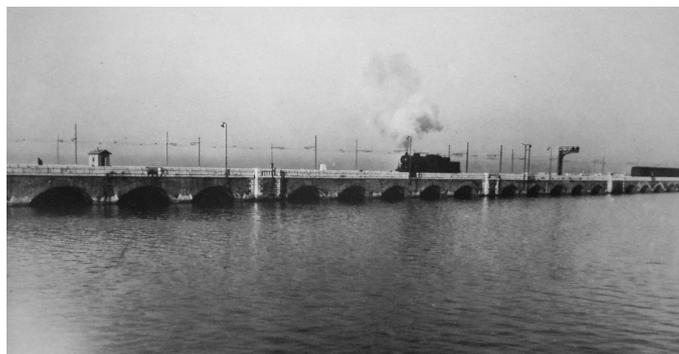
The masonry arch bridge of Venice lagoon under service loading (photo, FS Record Office, Venice).
